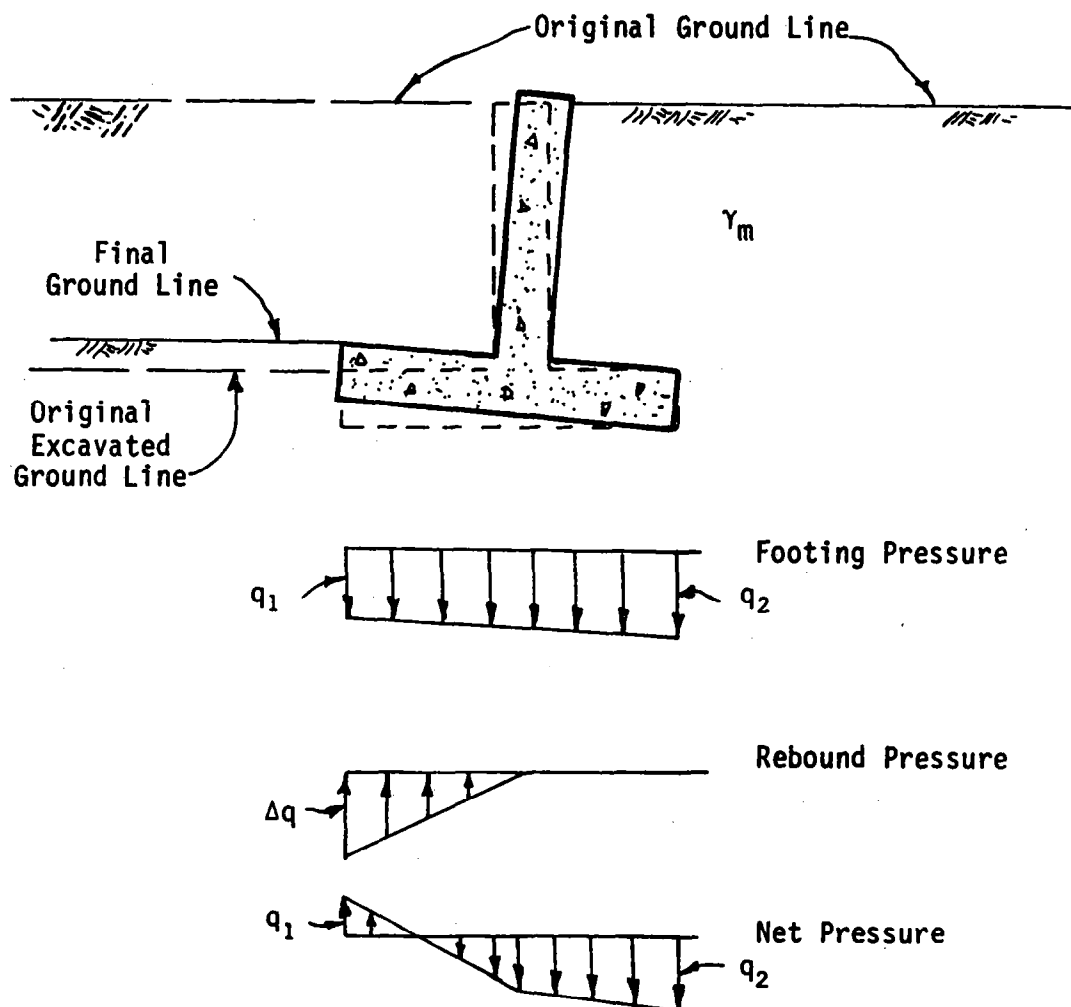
ELASTIC REBOUND OF FOUNDATION EXCAVATION AFTER
